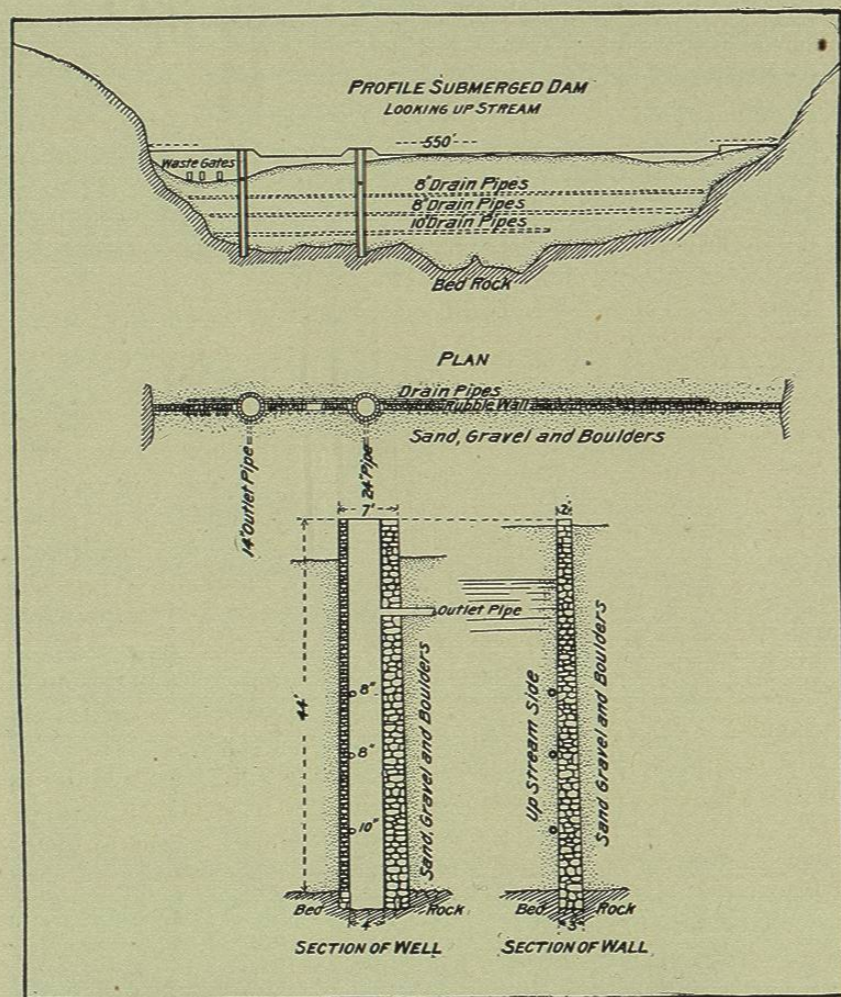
PLAN AND PROFILE OF PACOIMA DAM.
